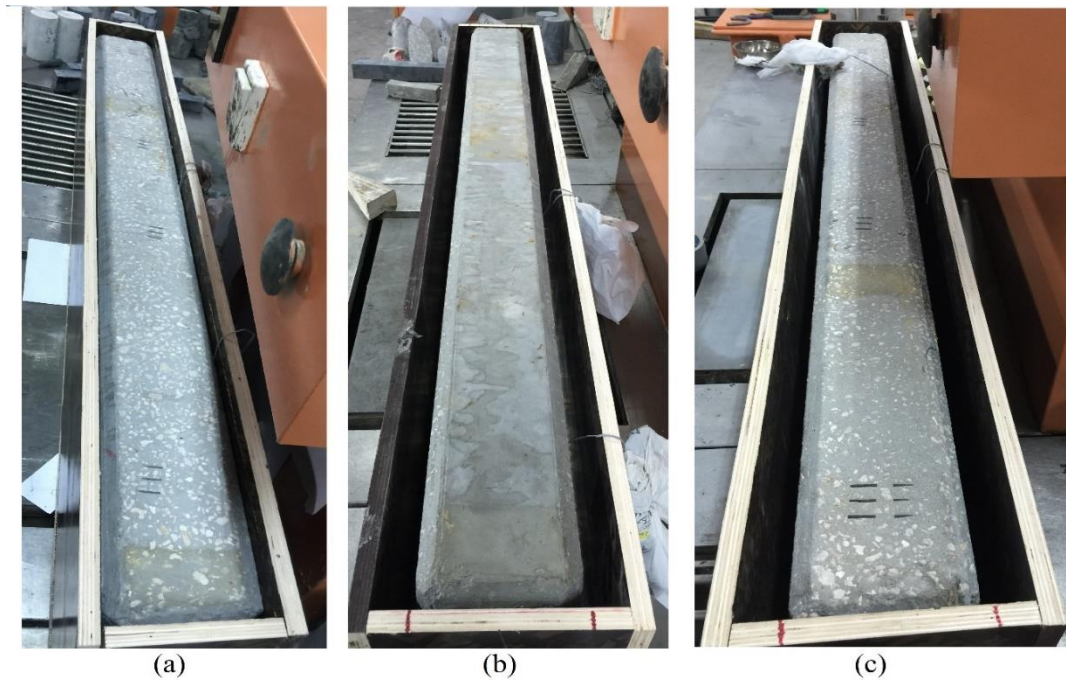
Beams prepared for (a) Bot side (b) 2-sided (c) 3-sided strengthening
